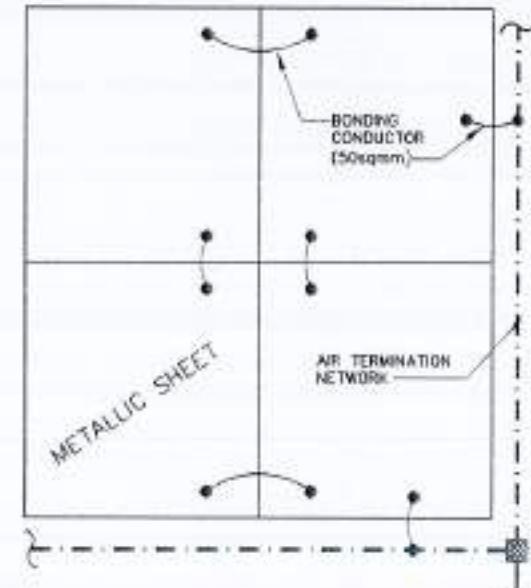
DETAIL-B RE-BAR & AIR TERMINATION DETAIL
